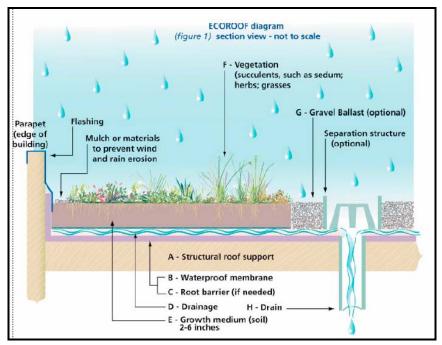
Extensive Green Roof with Single-Layer Construction on Inverted Roof
